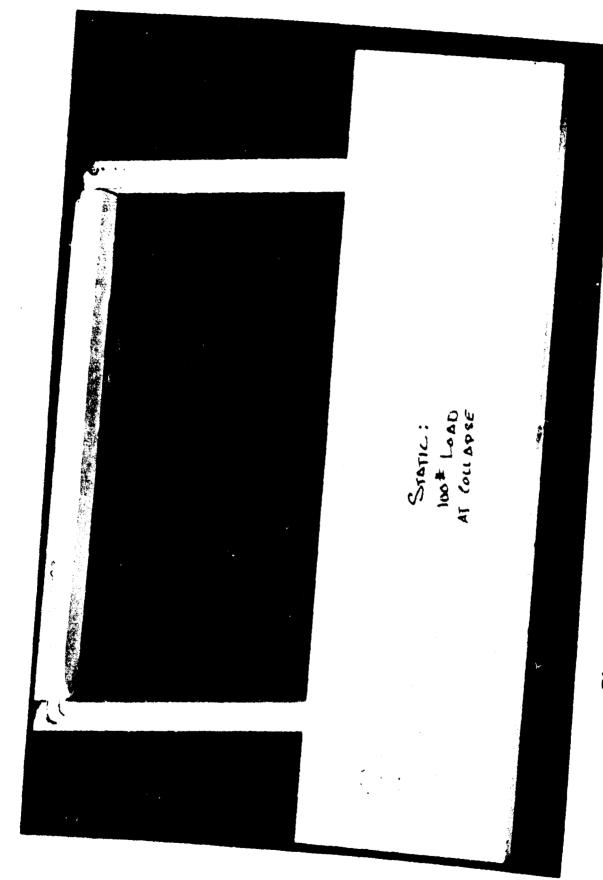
STATIC COLLAPSE, SINGLE-STORY FRAME
